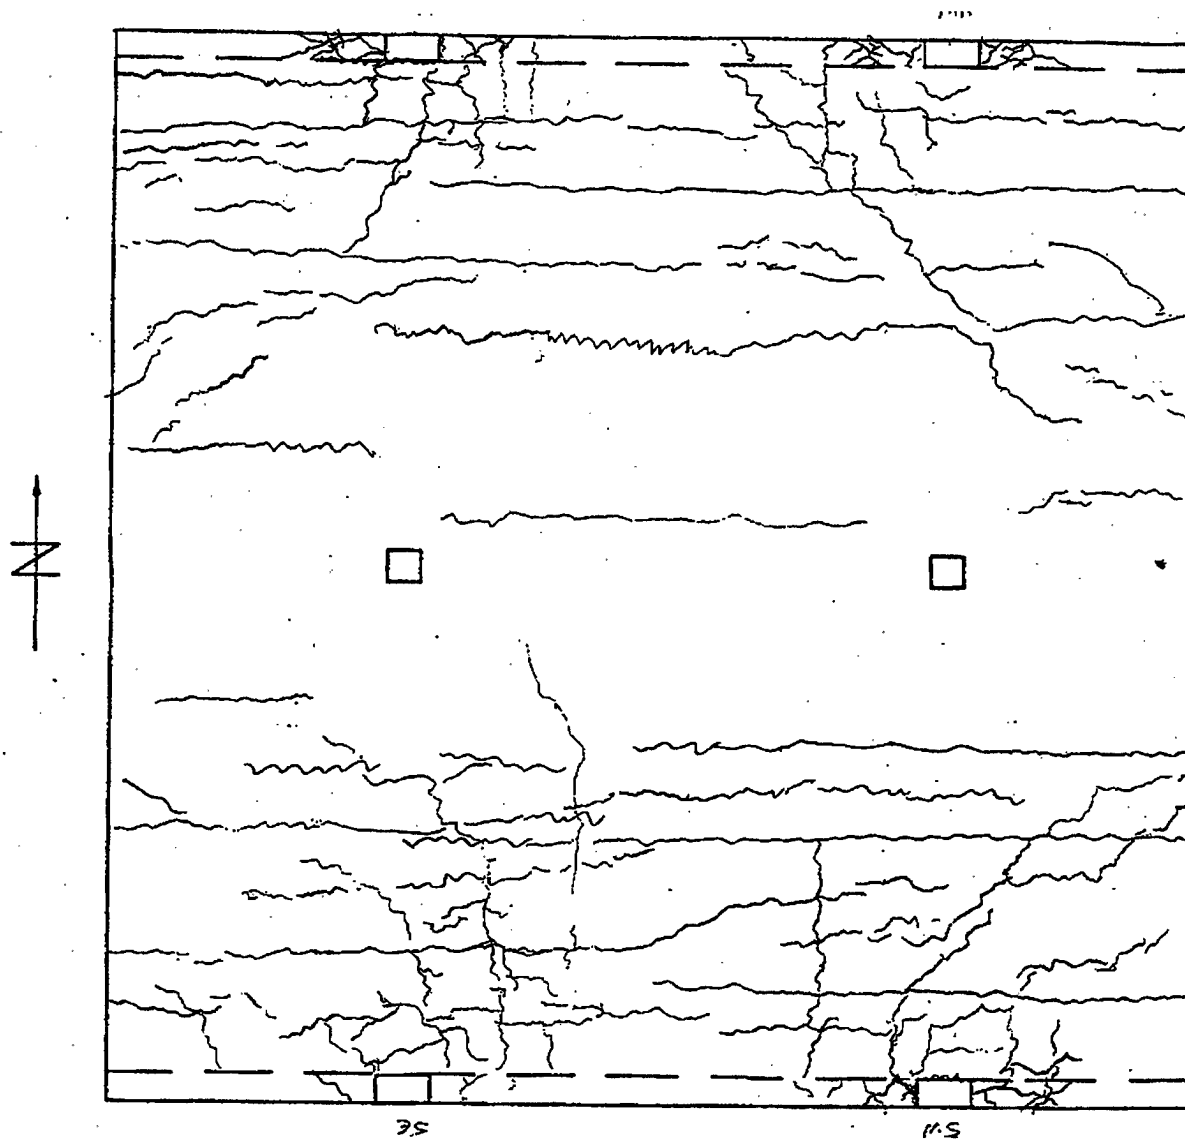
Crack Pattern, First Floor Slab, Bottom Side, Post-E200N
